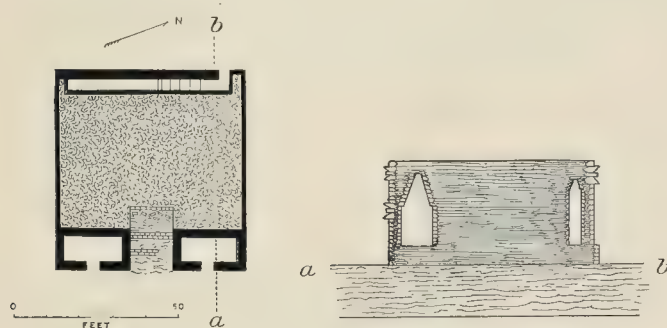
CHACMILTUN: EDIFICE 2. GROUND-PLAN AND SECTION.
